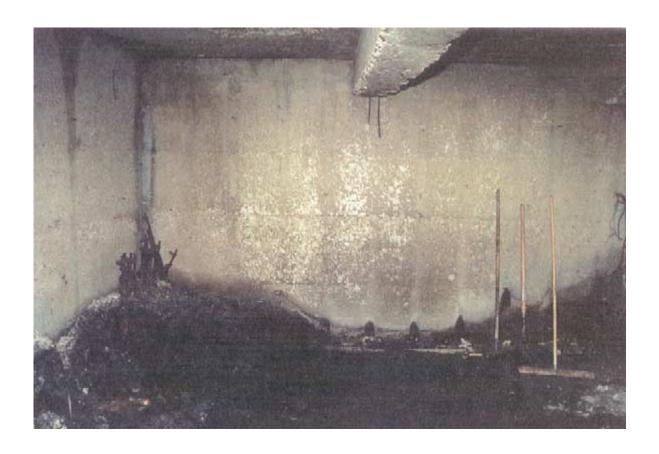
The above photograph again depicts the condition of the inside of the concrete, which constructed the bunker. Notice the pitting (missing pieces) on the concrete walls as well as the concrete beam in the ceiling.
